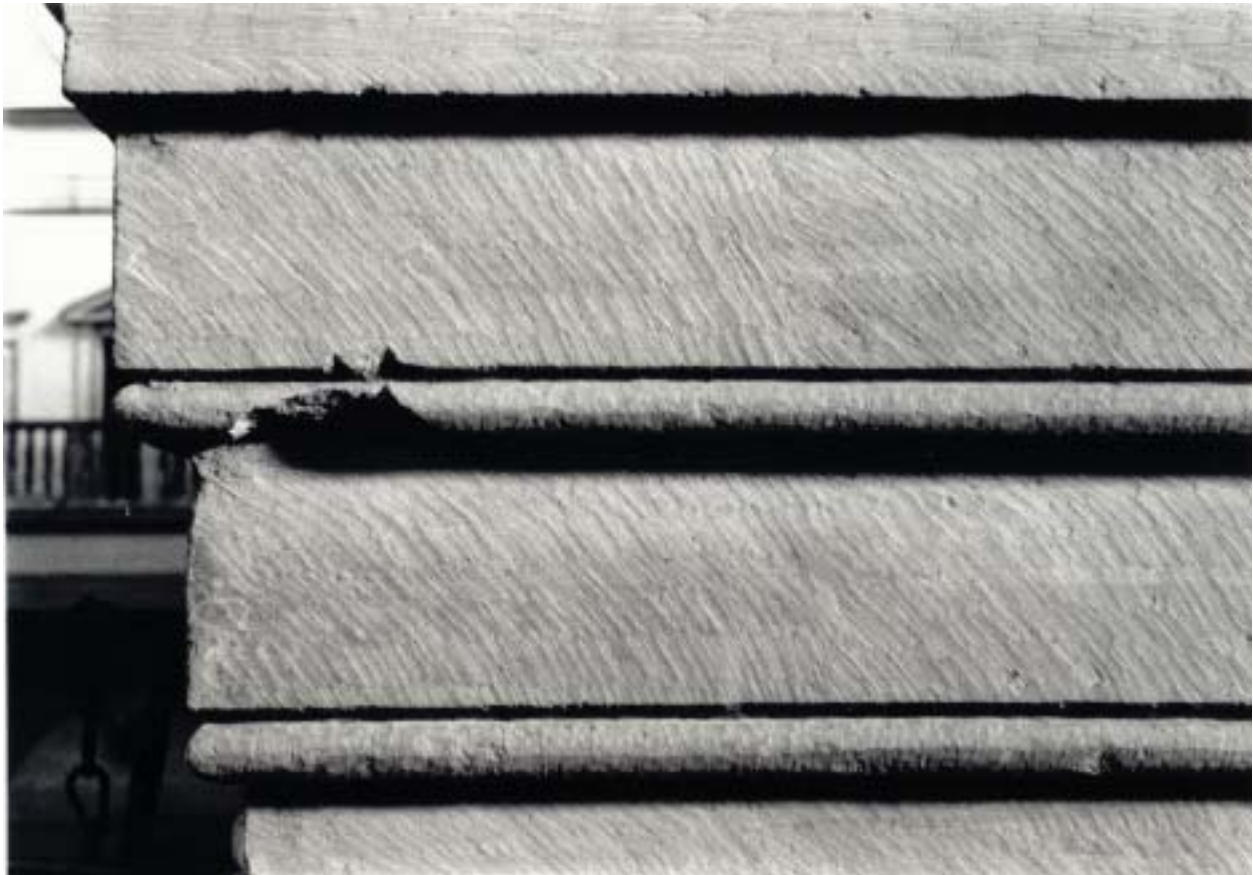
San Lorenzo Nave Arcades Phase II, Column 4, side c, architrave block detail.
